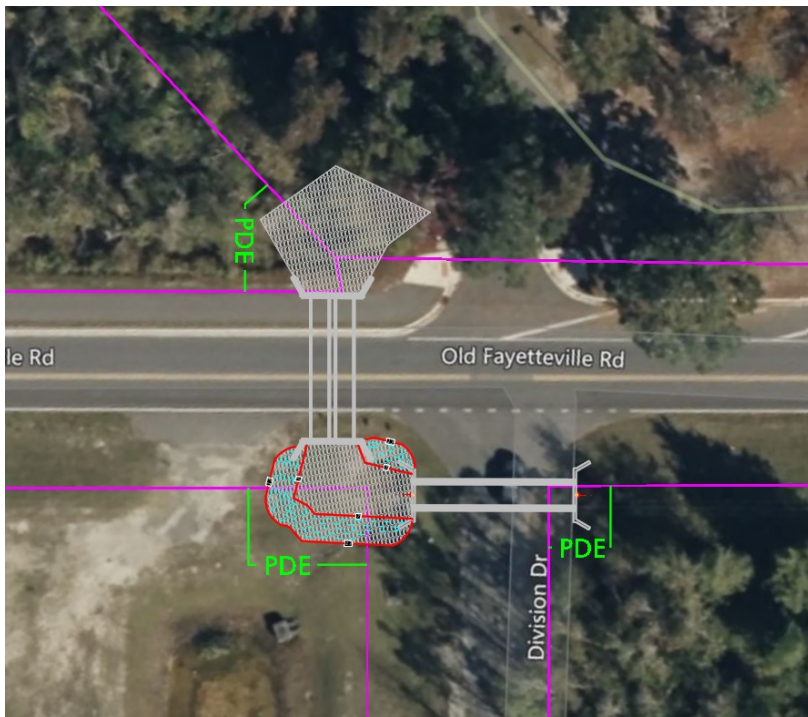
Intersection of Old Fayetteville Road/Division Drive, Leland, NC
